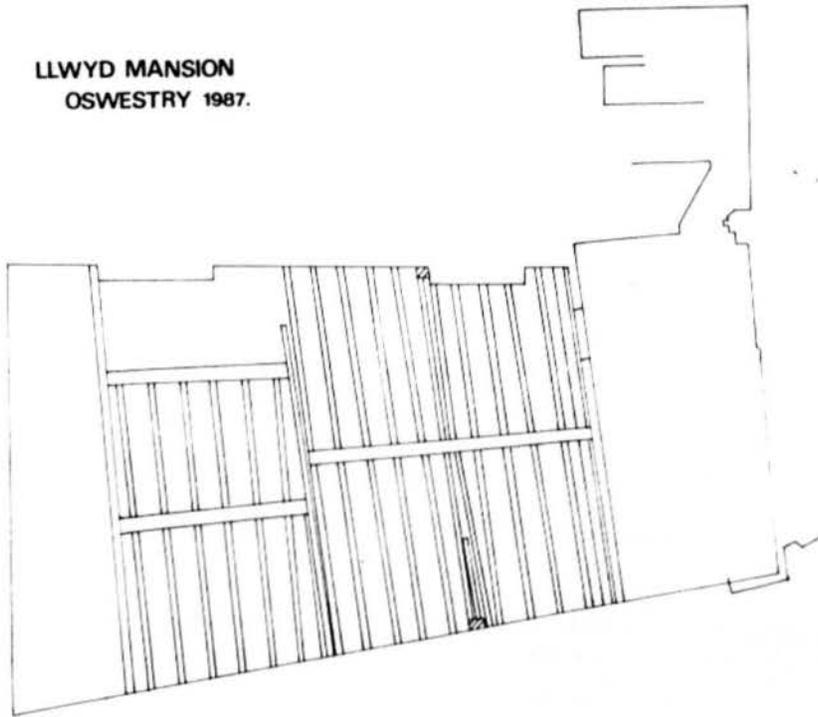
Floor Plans. Internal arrangements - A. Mirza
